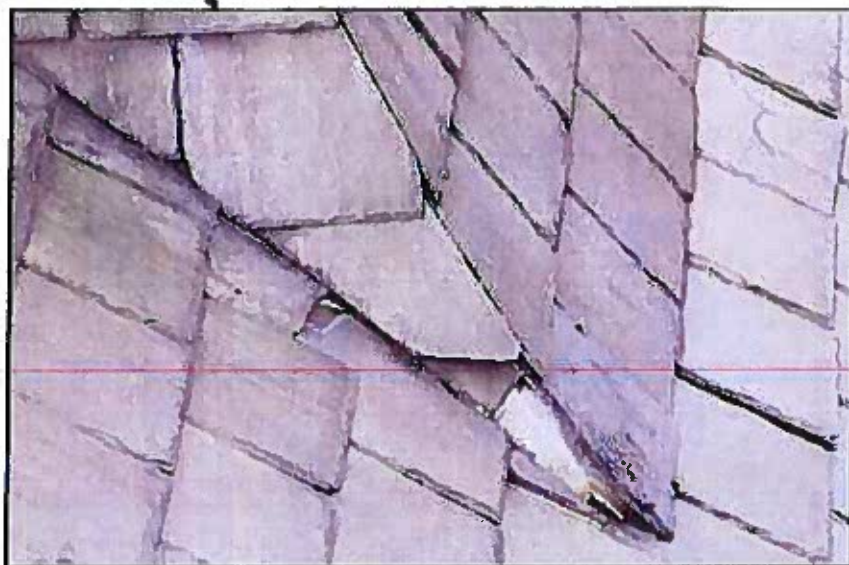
Flashing between cupola cheek wall and main roof is very worn where it is visible at the cupola base (arrow) and should be replaced with new copper flashings.
